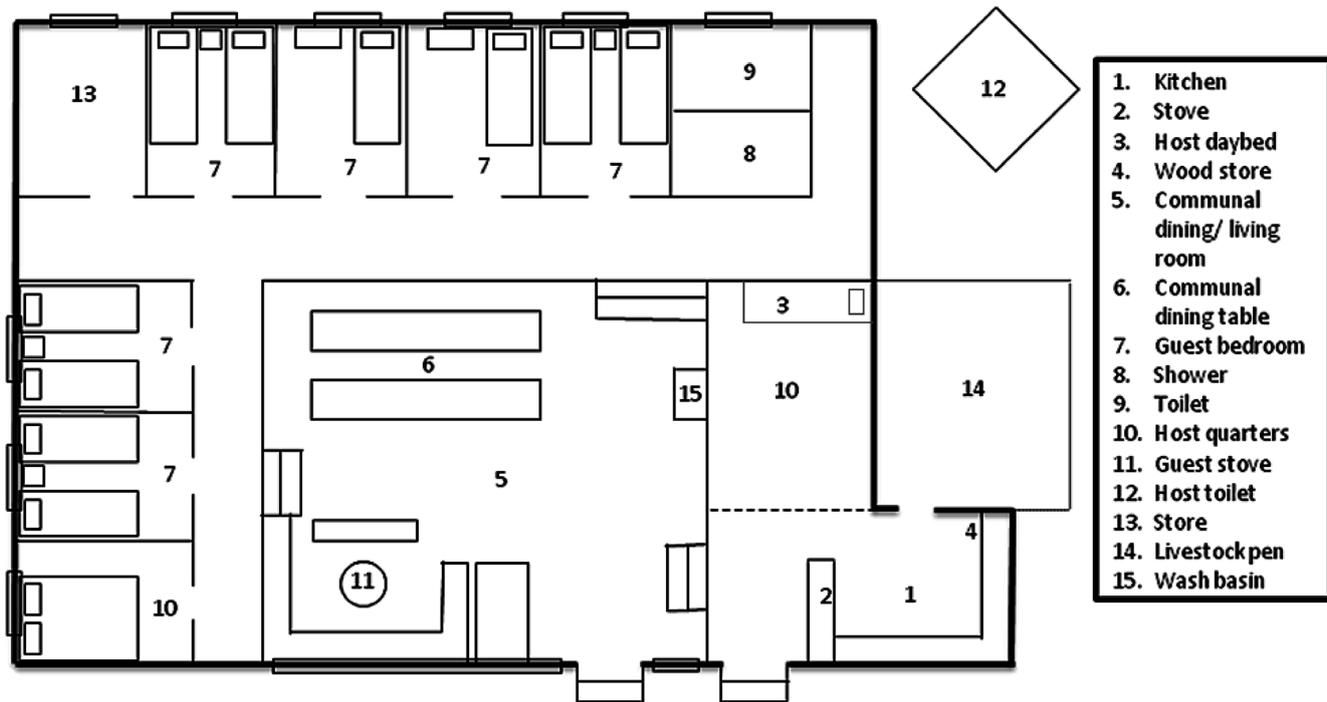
A floor plan of a typical tea house with a communal dining area (left) and an improved stove (right)
